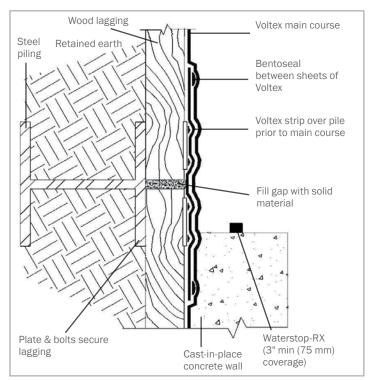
Lagging secured to inside surface of front pile flange. Install Voltex strip to cover mounting plates and bolts prior to main course (Plan View).
